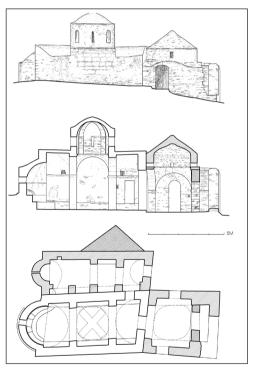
Agios Georgios at Epano Marathos. Plan, longitudinal section and north elevation.
